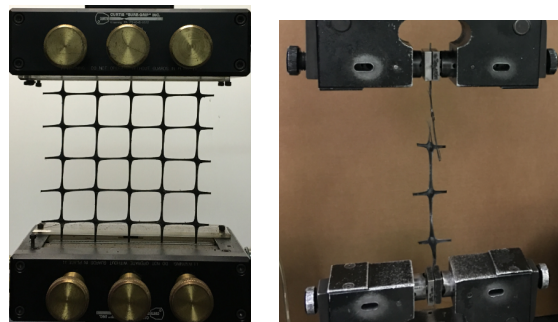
ASTM Fixtures used for Geogrid Testing (Left: wide specimen fixture, Right: Single rib fixture)
